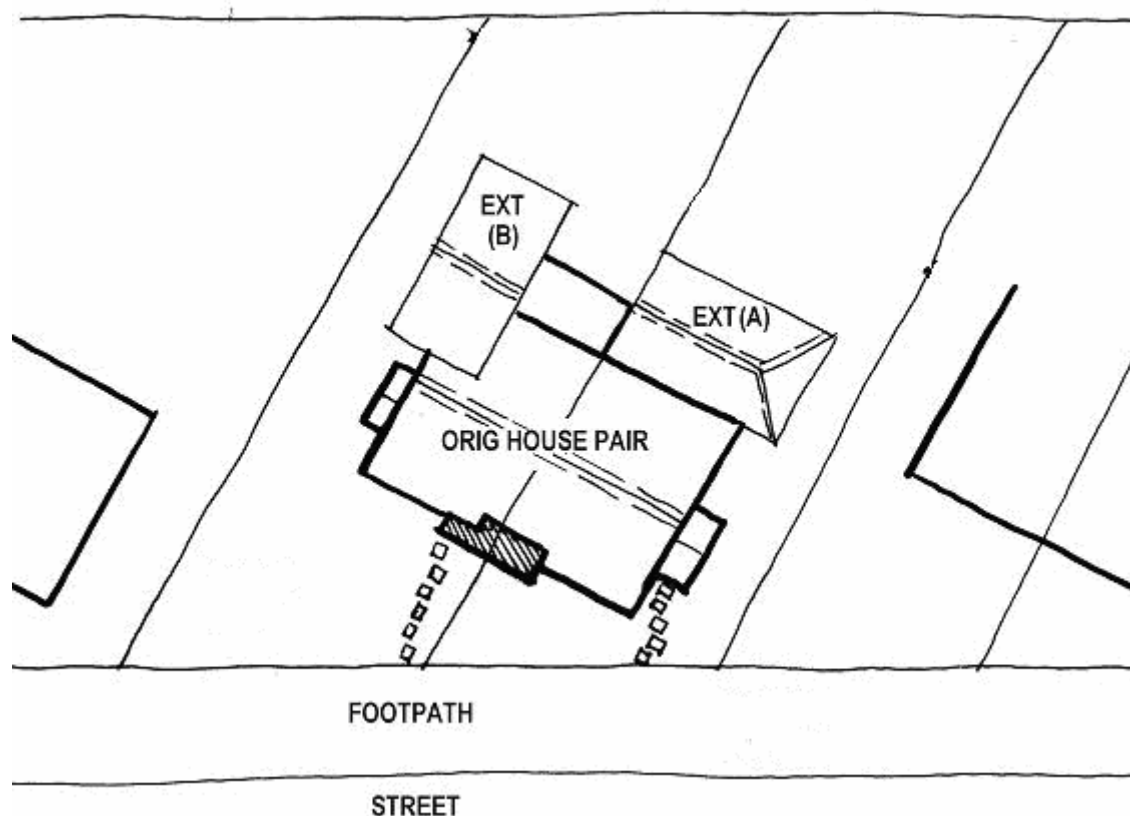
Plan view of extensions at the rear of diagonally placed dwelling pairs.
